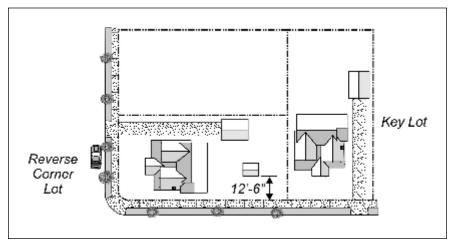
Accessory Structure on Reverse Corner Lot
